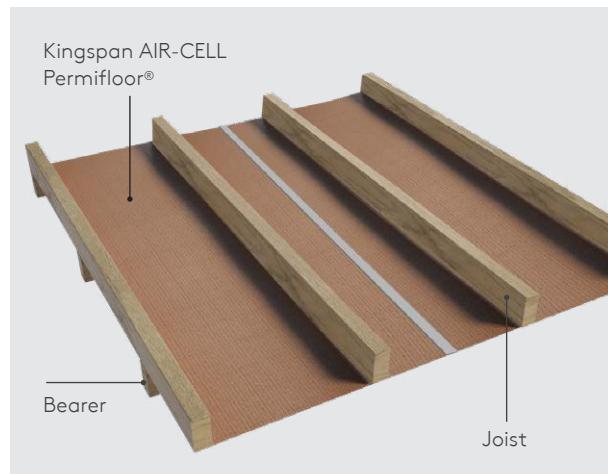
Kingspan AIR-CELL Permifloor® installed over bearers.
